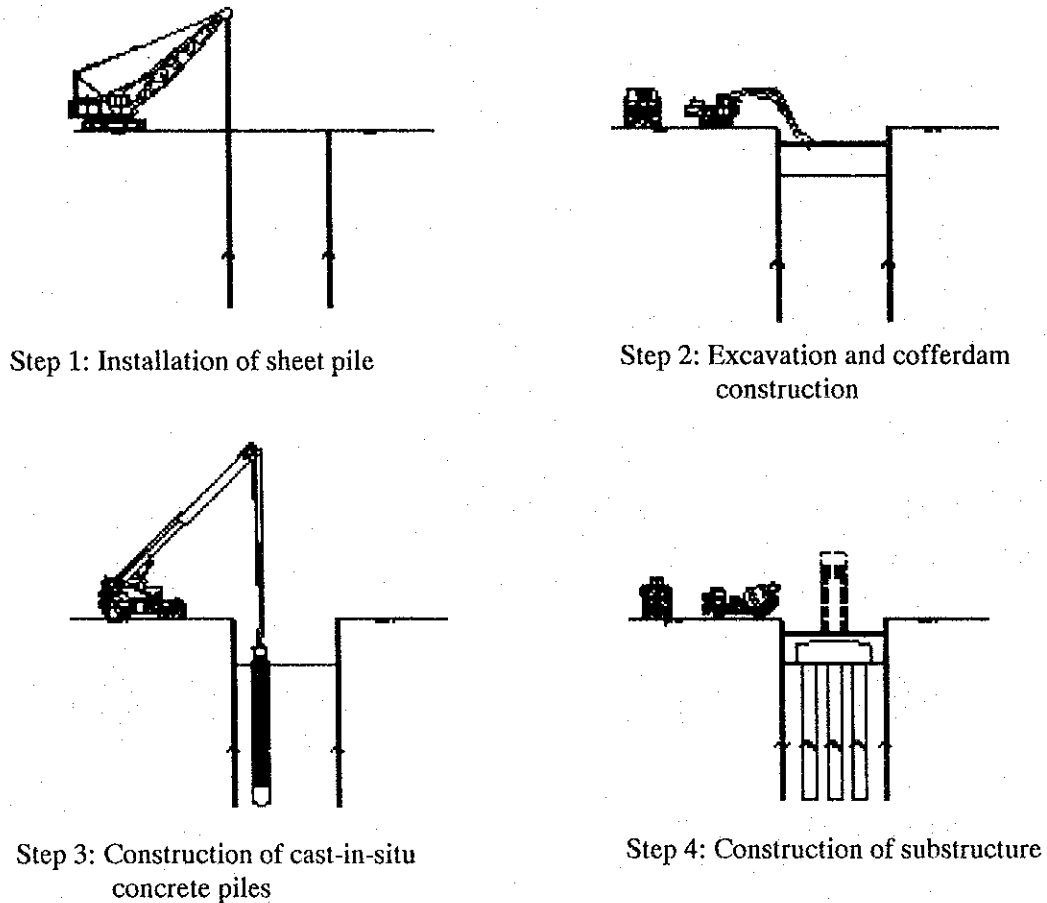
Construction Procedures for Substructure/Foundation for Approach Bridges
